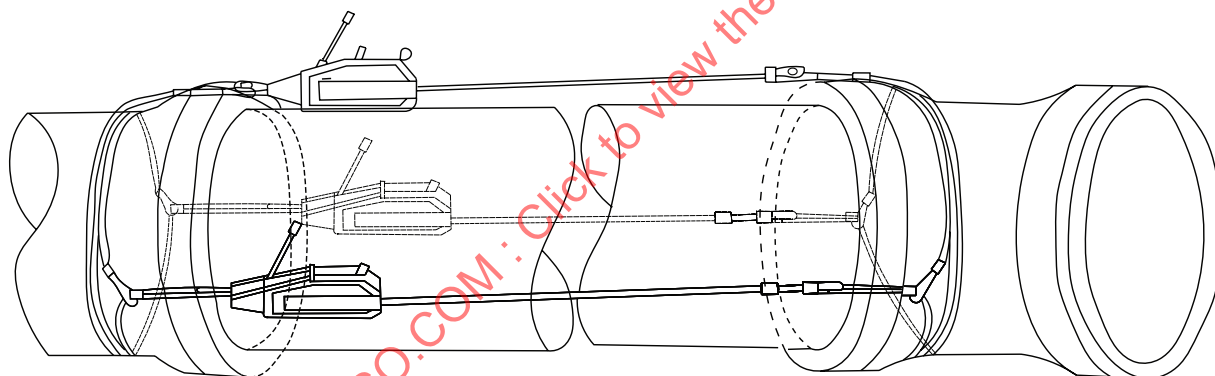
Jointing of fittings by jointing tackle (assembler)
